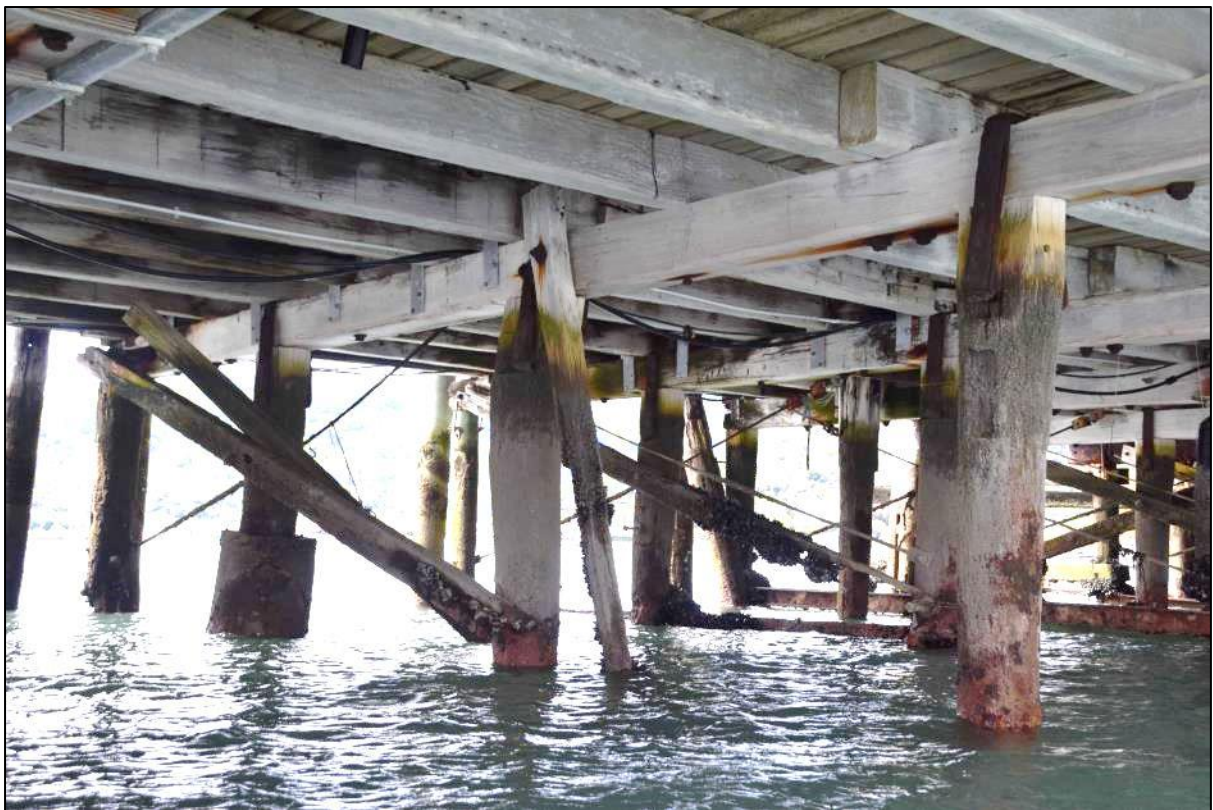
An image 2 bays closer to the shoreline than 16 showing the original widened structure under the original shed –with continuous pile cap spanning over the additional piles and wrought iron straps to the heads of the piles now delaminating and, in places, no longer connected to the piles. The bent in the foreground is missing bracing and one of the piles has a 'jacket' repair.
